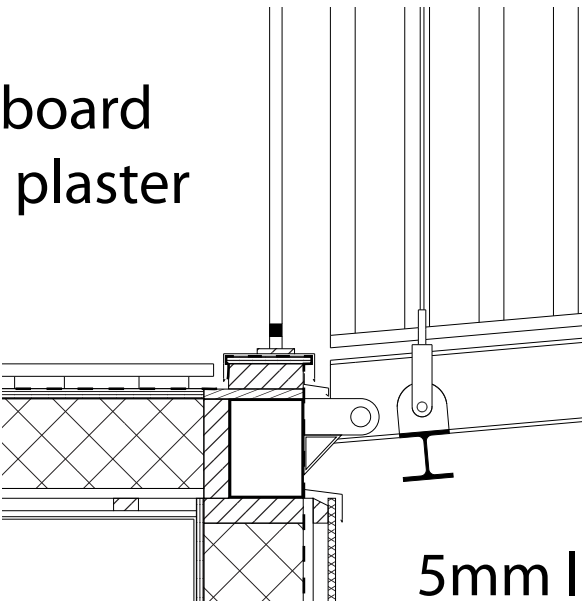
DETAIL TRANSITION INSIDE - OUTSIDE LAB
